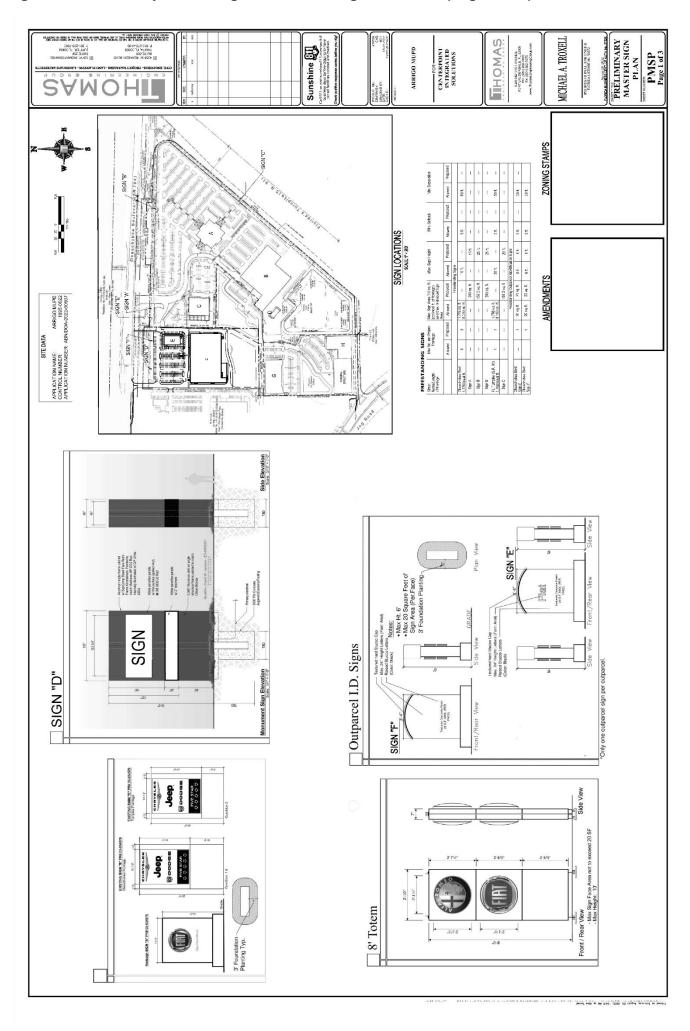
Preliminary Master Sign Plan dated August 22, 2022 (Page 1 of 3)
